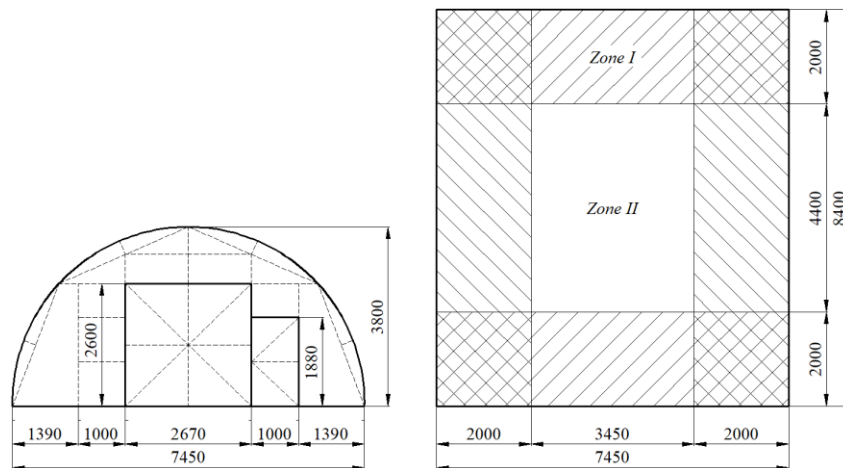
Industrial greenhouse "Fermer 7.5" and the soil zone layout chart.
